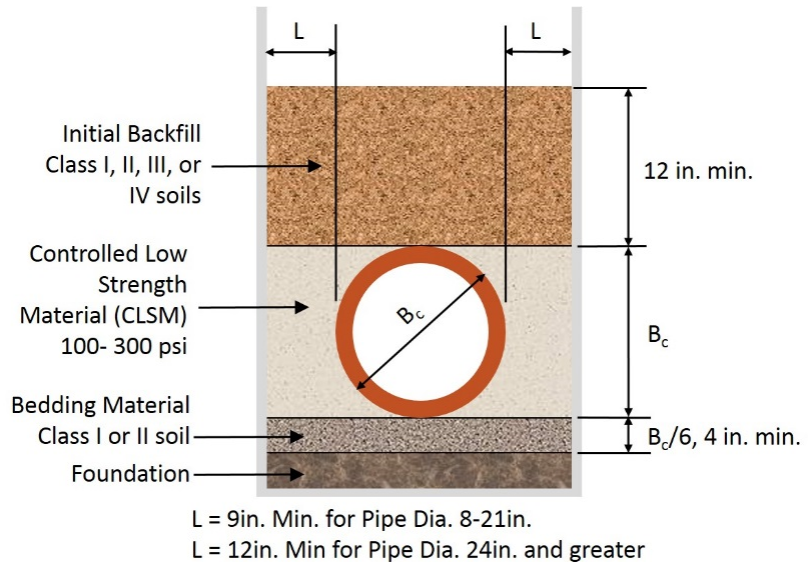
Controlled Low Strength Material (CLSM) Bedding: Load Factor 2.8
